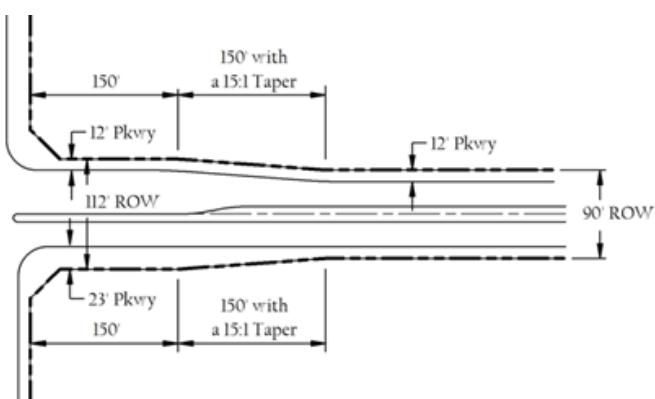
Typical Roadway Dimensions Approaching Minor Roadway Intersections
